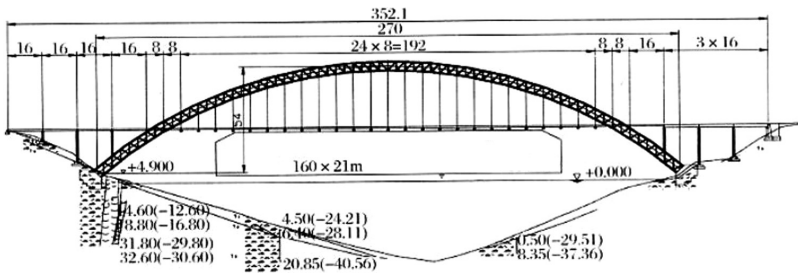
General arrangement of Xiangshan North Gate Bridge
